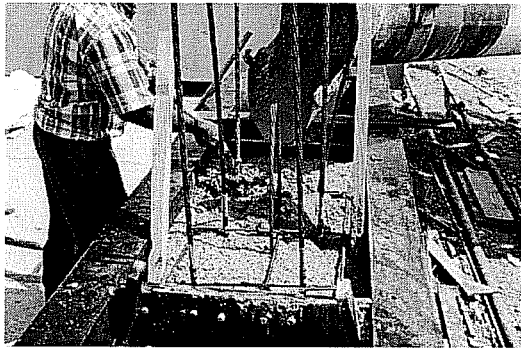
Concrete Being Placed for Pull-Out Test Block
